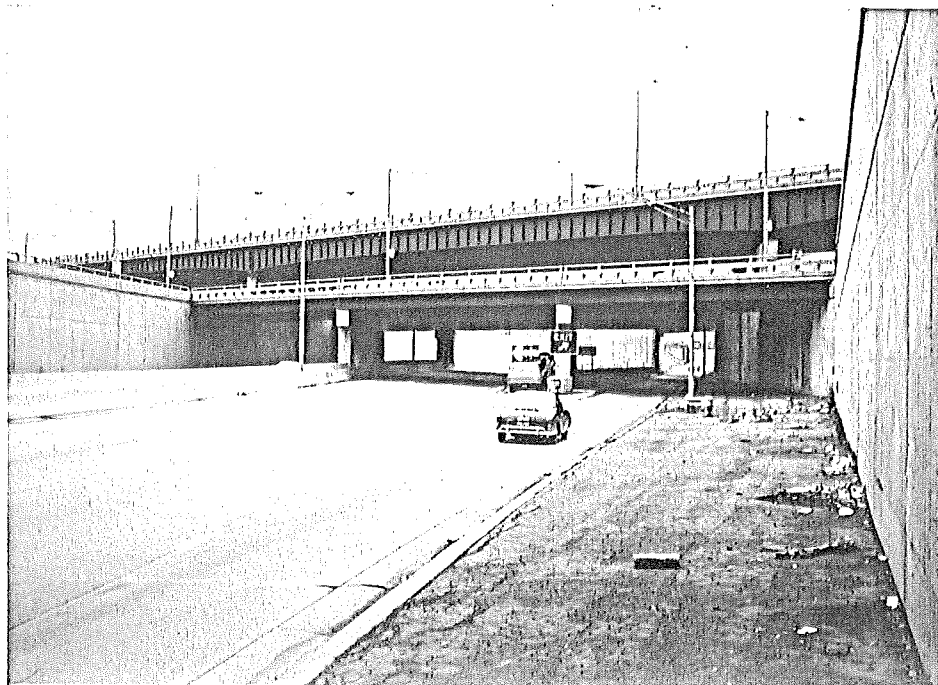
Geometry of bridge (lower structure) where salt spraying and dusting contaminates the unpainted steel.
